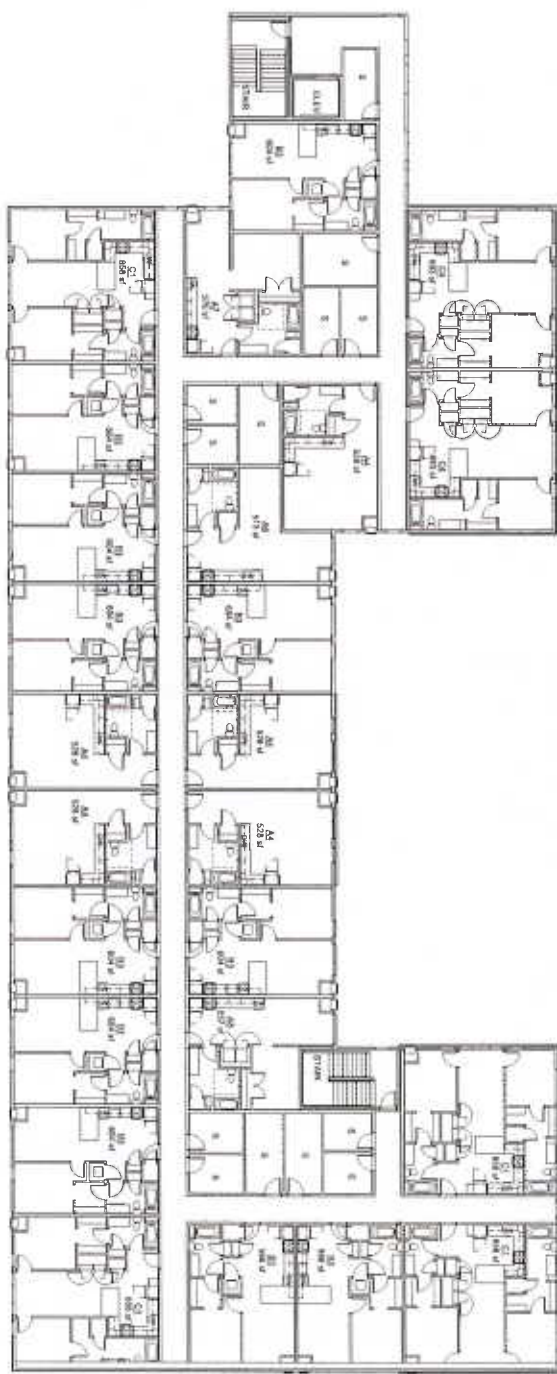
SECOND LEVEL FLOOR PLAN - MAIN
